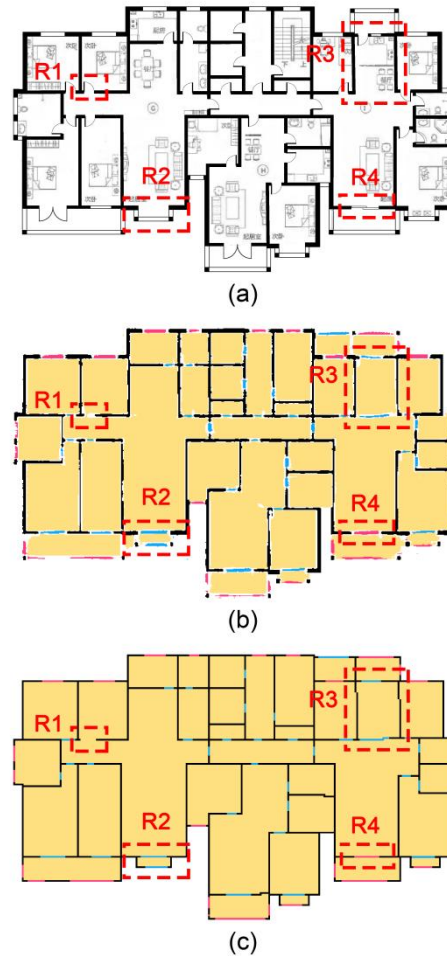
Wall errors of architectural element extraction (a) input floor plan (b) segmented floor plan (c) vectorised floor plan
